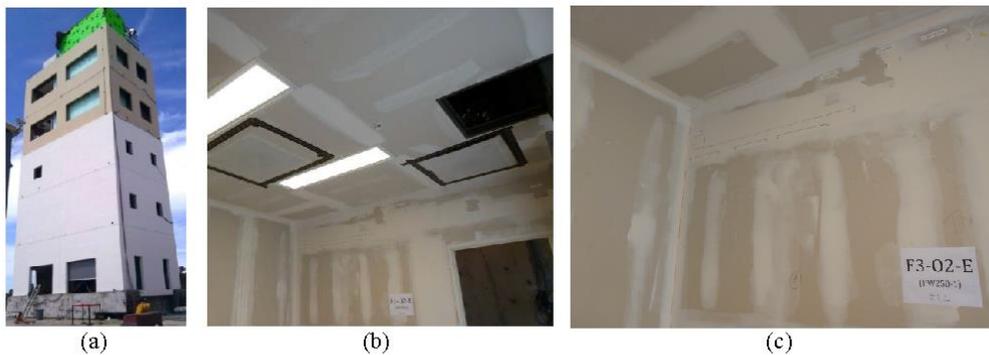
(a) Façades systems; (b) Floor 3 ceiling system (c) Floor 3 partitions.
